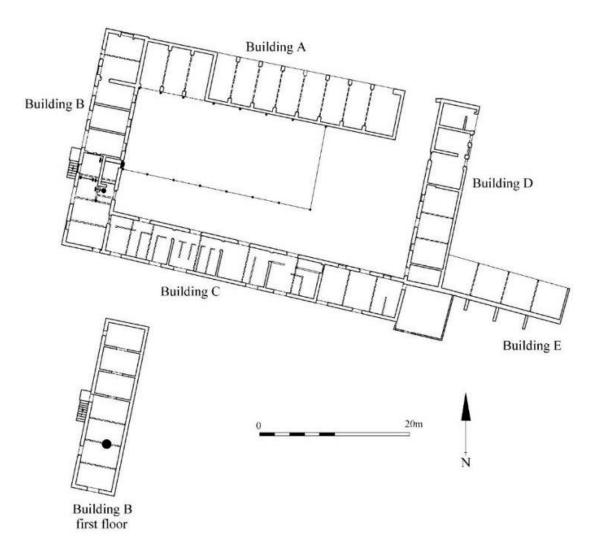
West yard buildings A to E Modified from David Granger Architects drawings Note the Building E is discussed in the east yard section below
